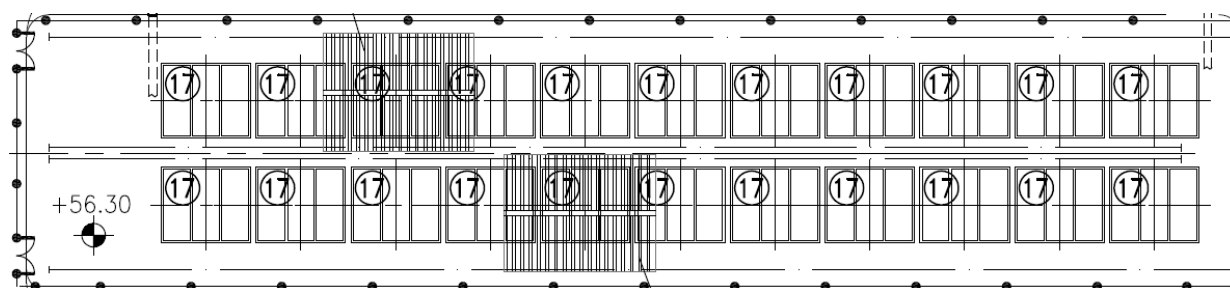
GENERAL LOCATION OF SLIDING ROOFS
